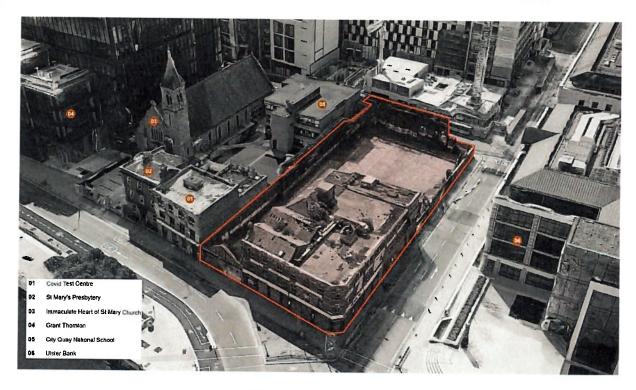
Existing site - pre demolition (ref: Mahony Architecture)
